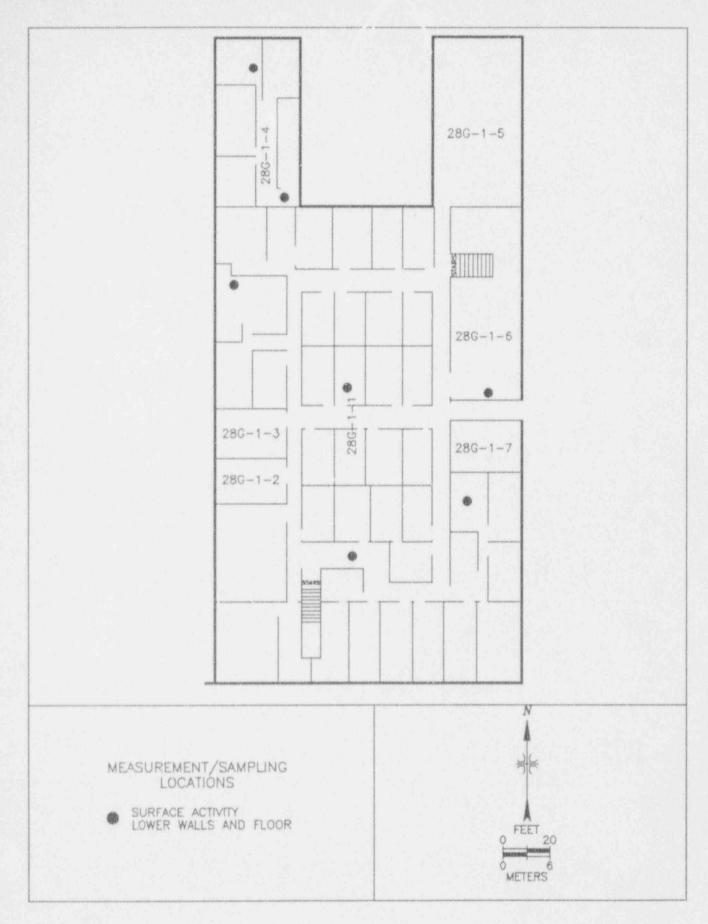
Building 9, Second Floor - Measurement and Sampling Locations
